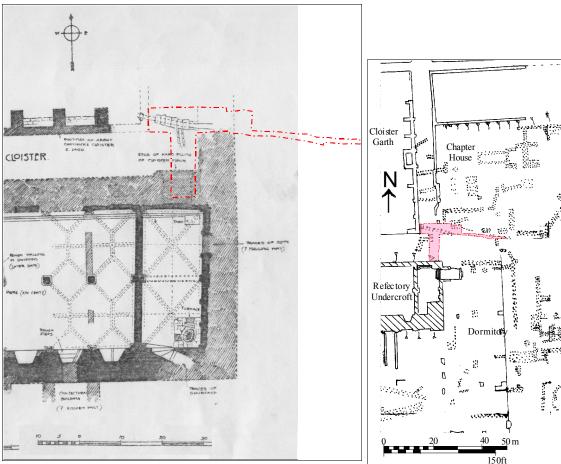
Detail of plan of the Refectory Undercroft produced by Bligh Bond (1911, Plate II) with the 2007 trench outlined in red.
